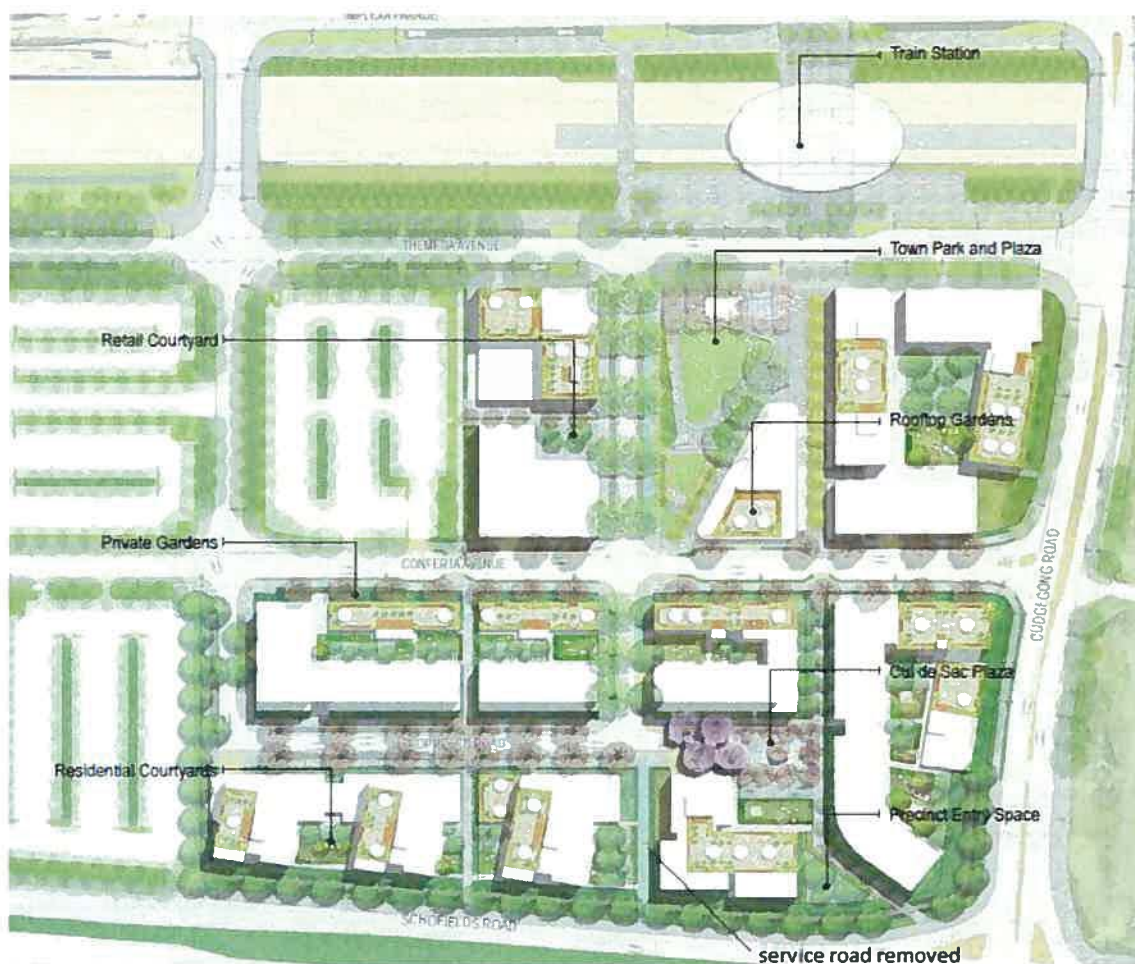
| Indicative site plan showing relocated park and removal of service road (Source: Applicant's EIS)
